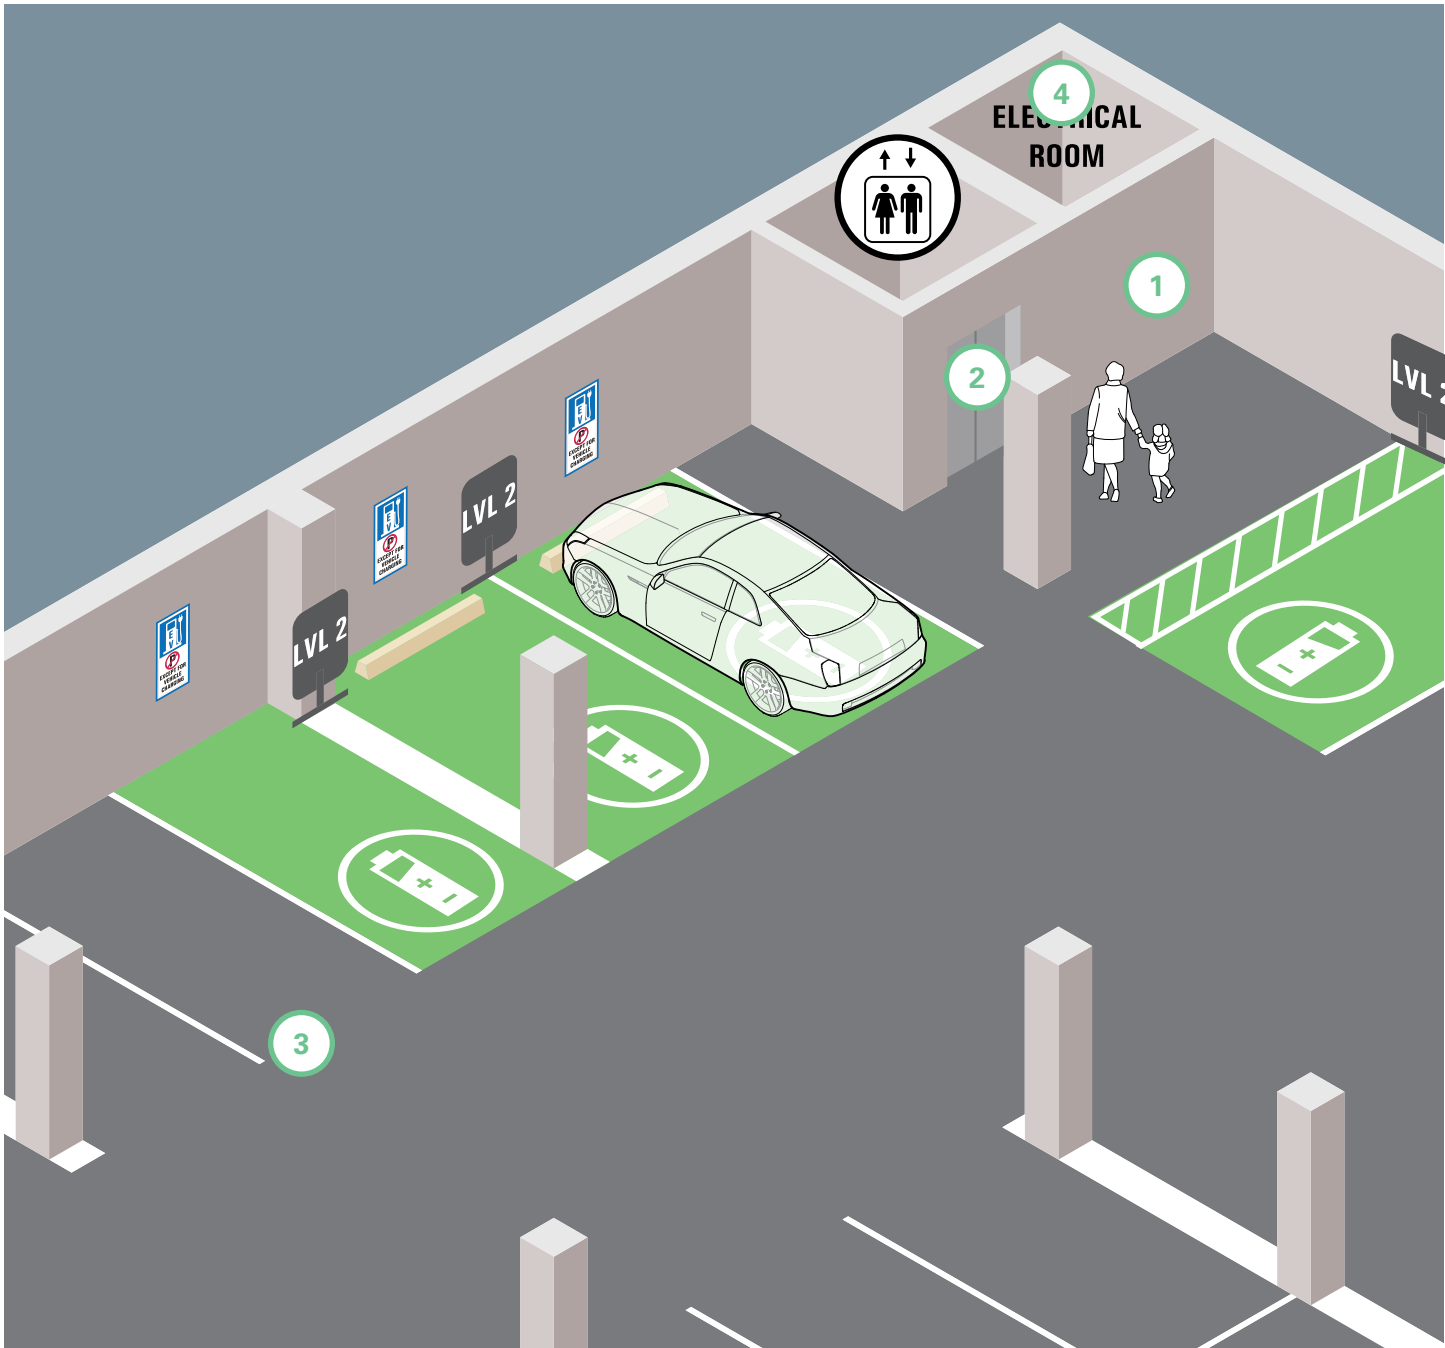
SITING AND DESIGN GUIDELINES FOR MULTI-USE RESIDENTIAL PARKING
